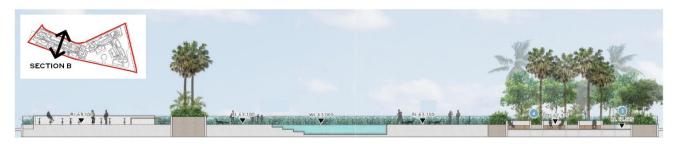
Landscape Masterplan Extract: East Tower Rooftop 'Section B'
